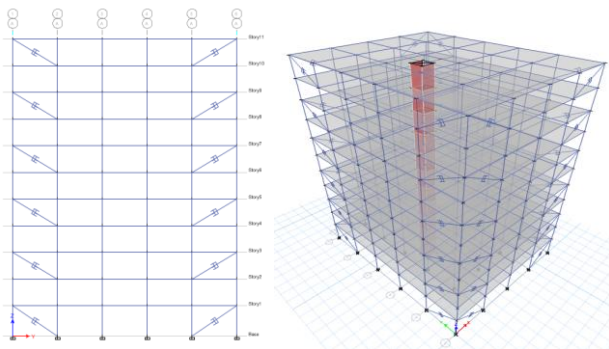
RCC building with corner Fluid Viscous Dampers for alternate storey's.
